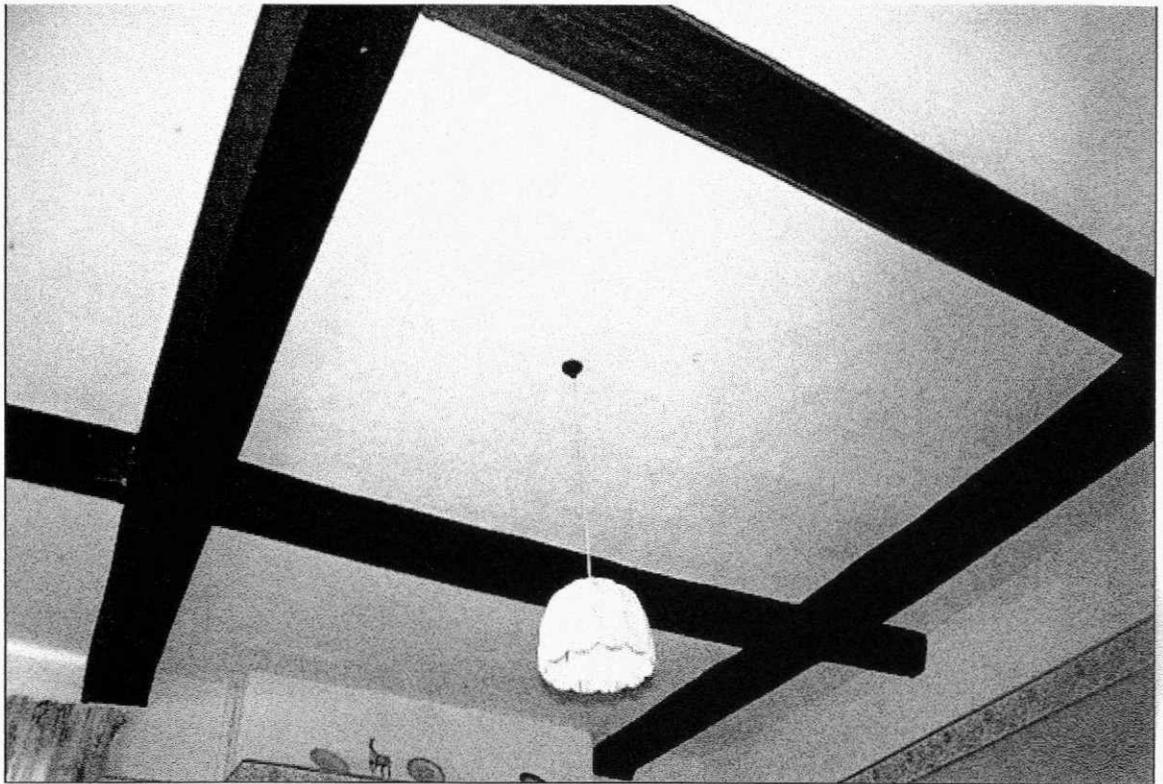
(above): Cross-beam ceiling of first chamber on second floor
